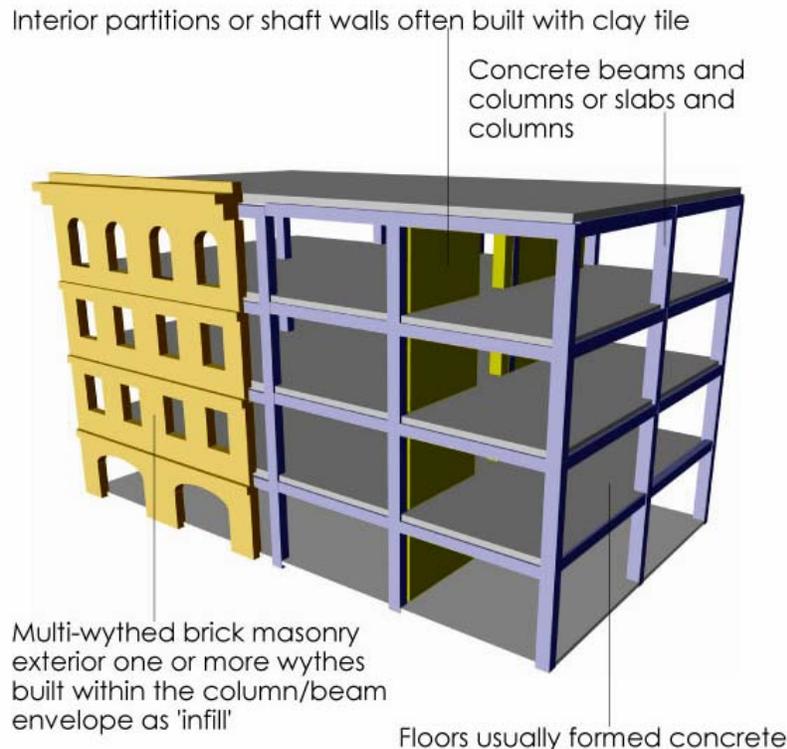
Building Type C3: Concrete Frames with Infill Masonry Shear Walls
